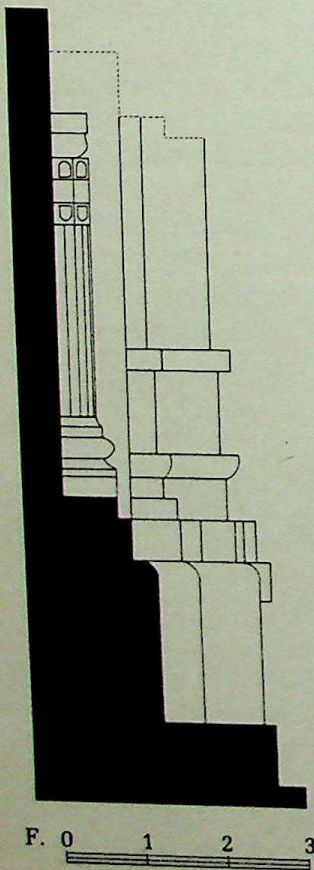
Nagrā. Brick temple, moulded platform, sectional elevation.
